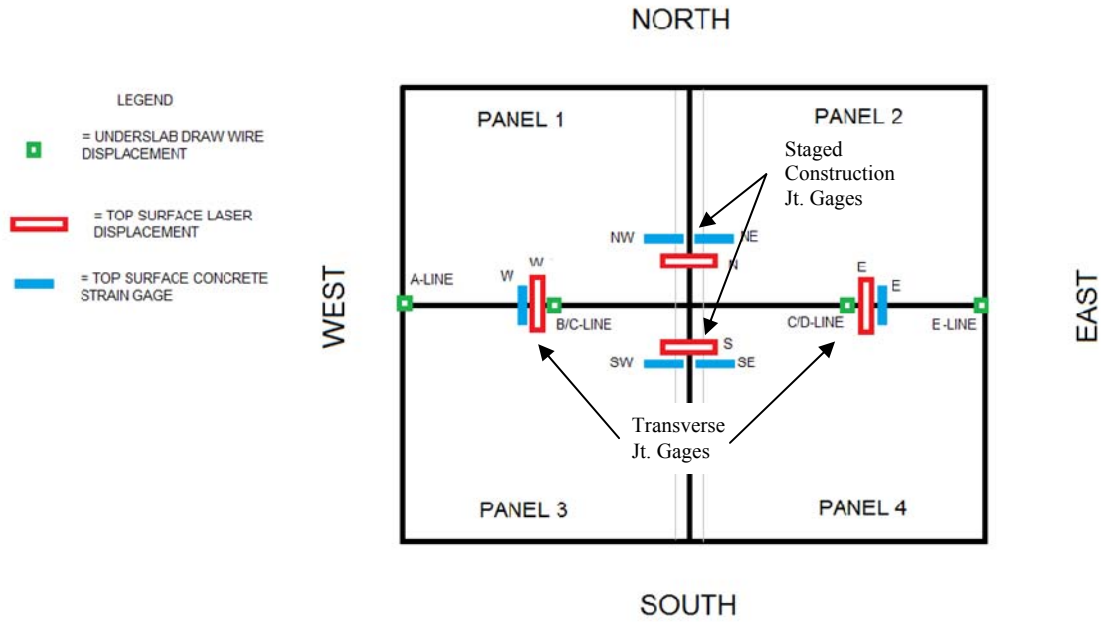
Surface Gage Locations and Orientations of Transverse Joint
